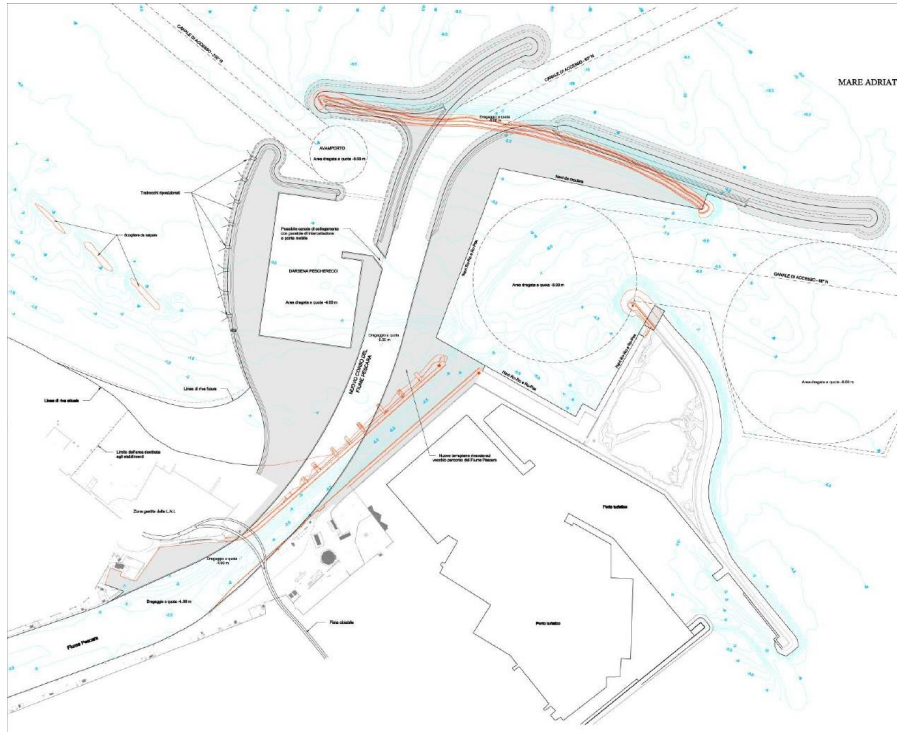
Overlapping of the existing configuration and the new plan. Source: Marina di Pescara Master Plan.
